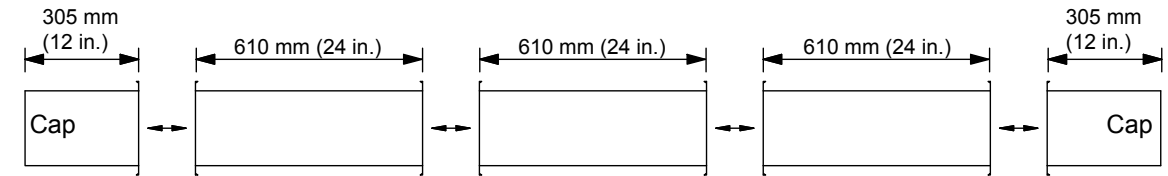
Rectangle or Long Seam Round and Oval Flange Connections
